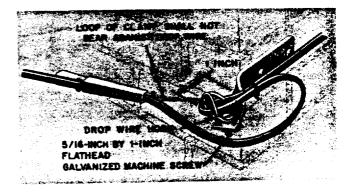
Corner Bracket Equipped With Drop Wire Hook
